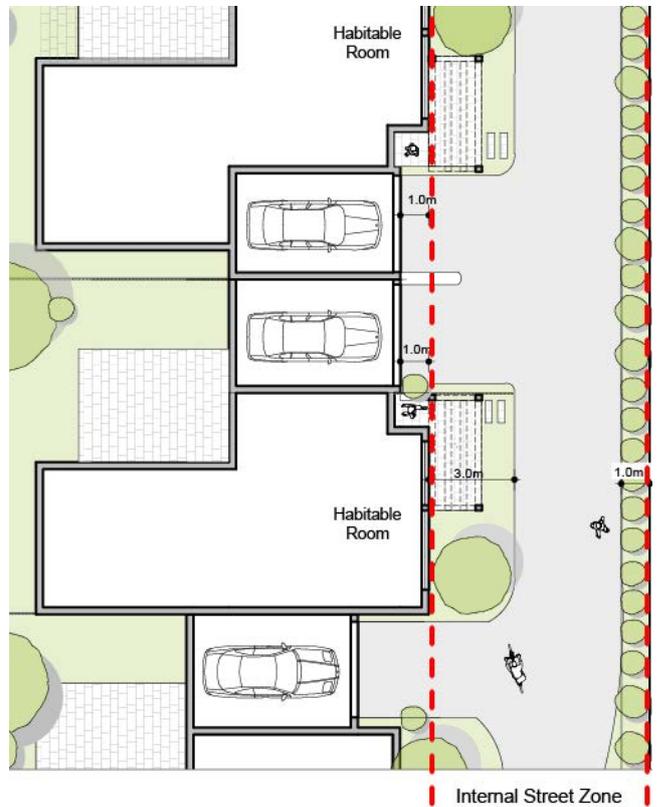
New internal lane providing access to dwellings behind street frontage and encouraging shared solutions
